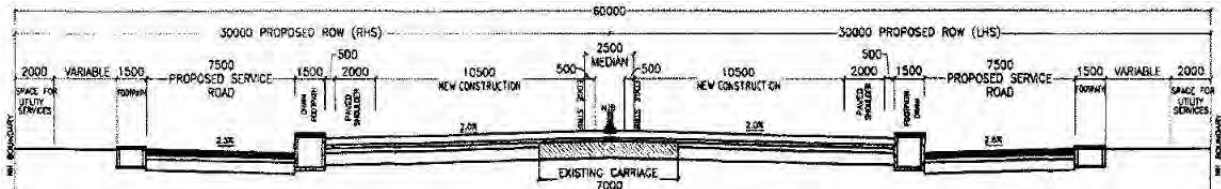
Typical Cross Section for concentric widening with both side service road (TCS-11)
